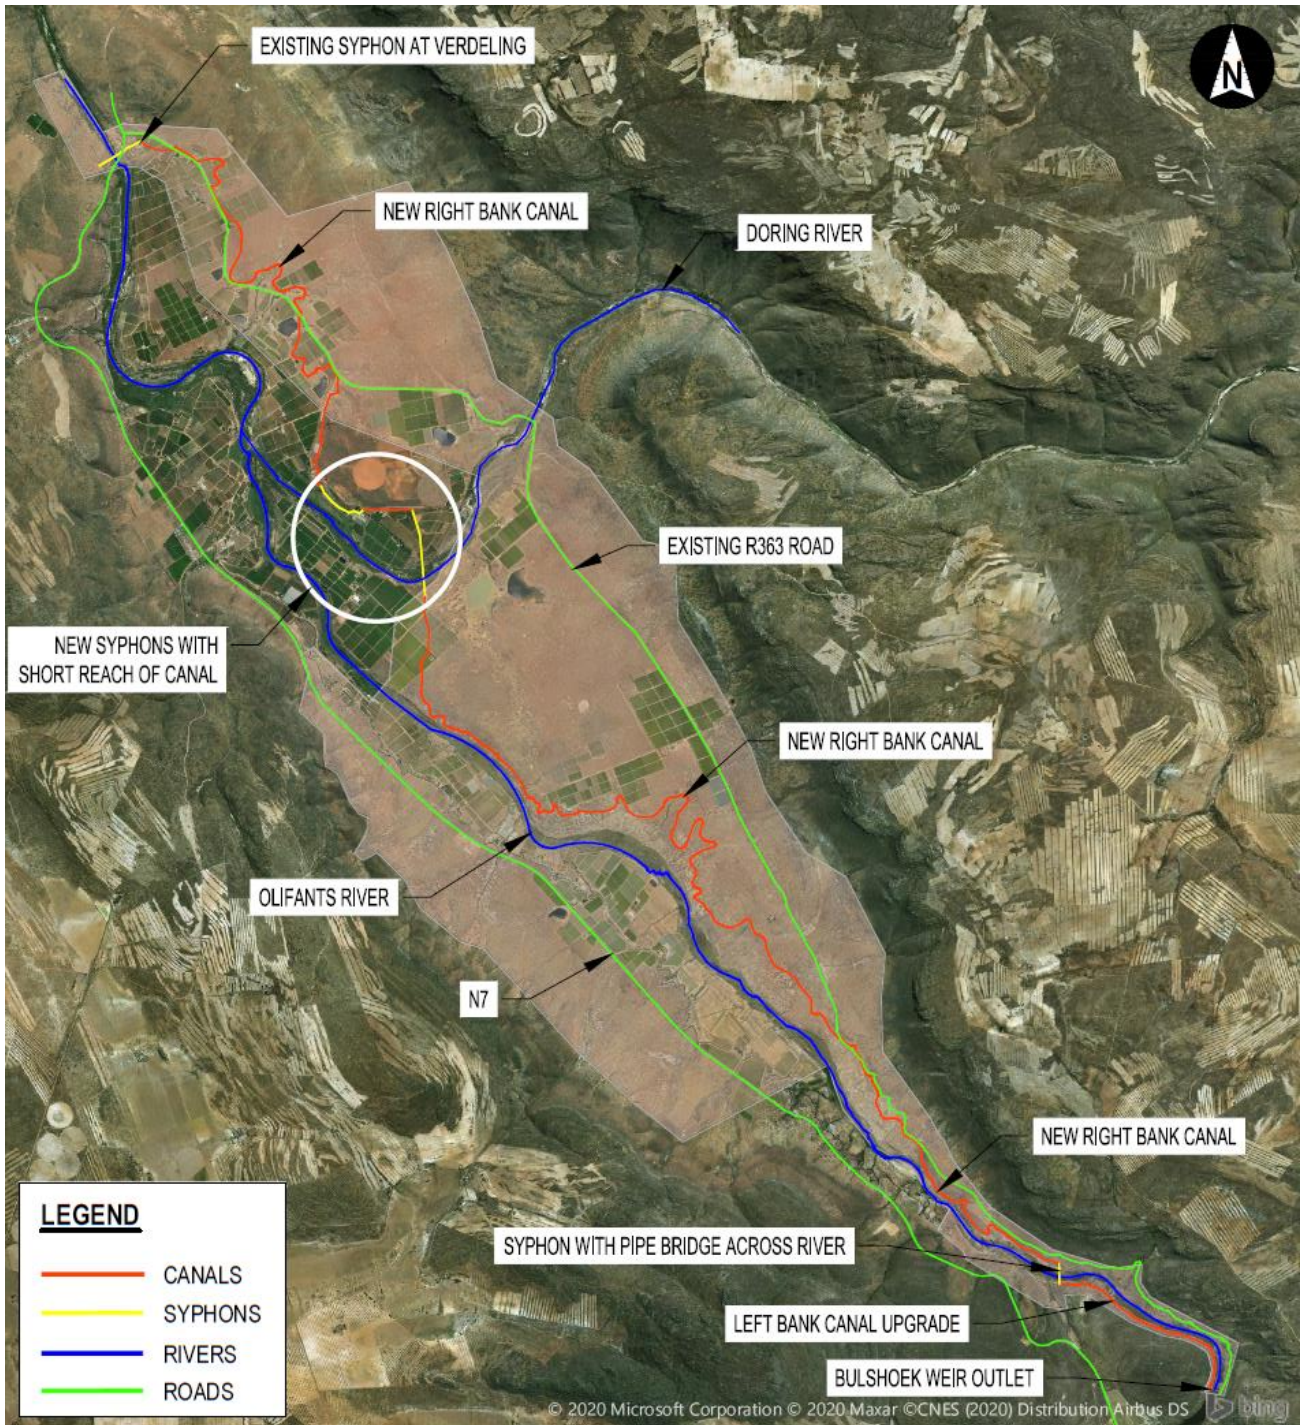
Overall layout of the Right Bank Canal Scheme
